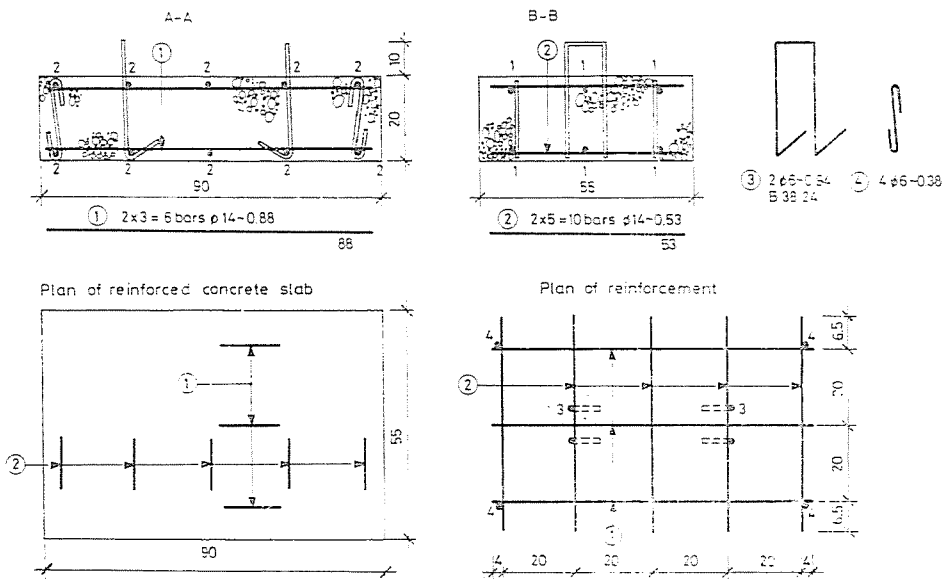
The experimental reinforced concrete slab model (1st test). Materials: Steel: B 60.40 (ϕ14). Concrete: B 400 — 15 K
